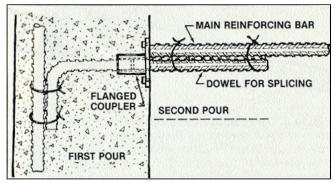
Substitute for standard dowel bar as used at construction joint (showing lap with main bars). A flanged coupler (shown) or integrally flanged dowel is attached to the form bulkhead for first placement of concrete. After forms are stripped, a threaded dowel of suitable length to complete the lap splice is inserted into the coupler.
